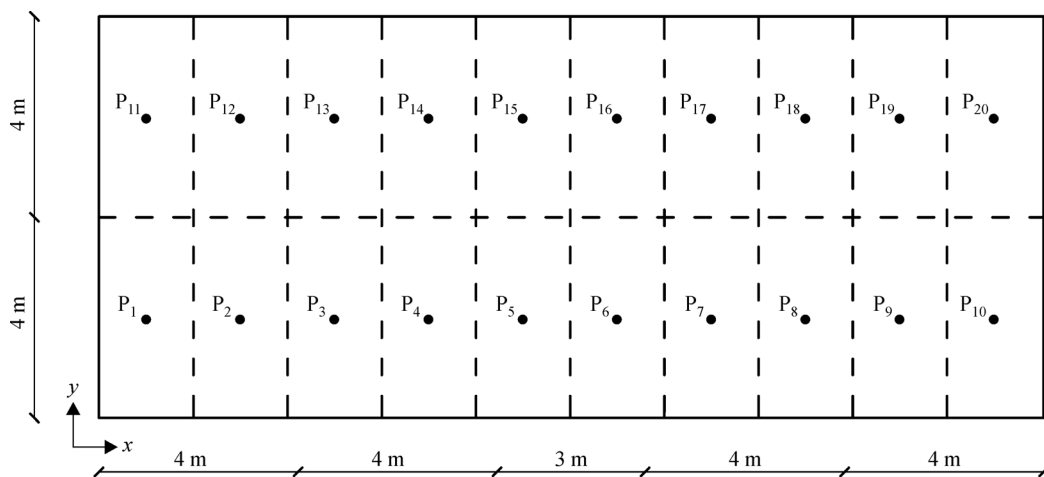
Meshing the plan of the first floor and the location of index points in each structure element
